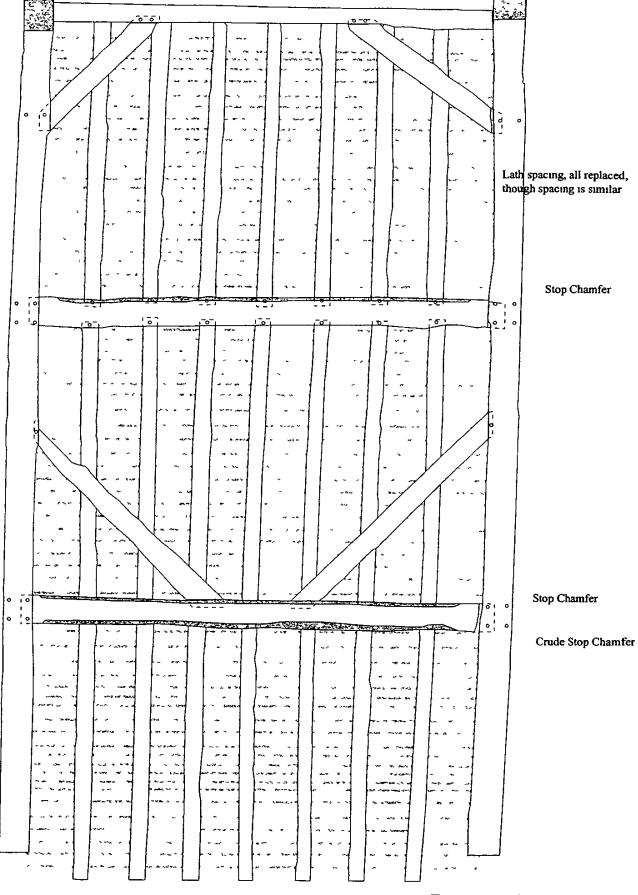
Planar Roof Bay Showing positions of roof timbers and laths
